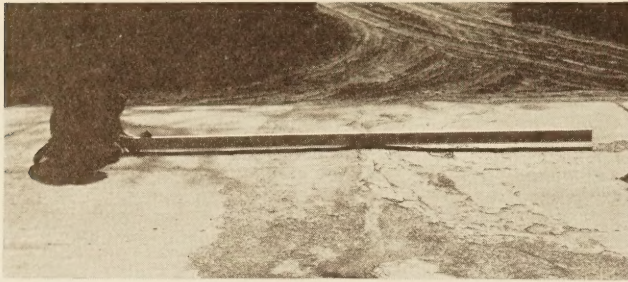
IMPACT REACTIONS PRODUCED AT A HEAVED JOINT ON A CONCRETE PAVEMENT
